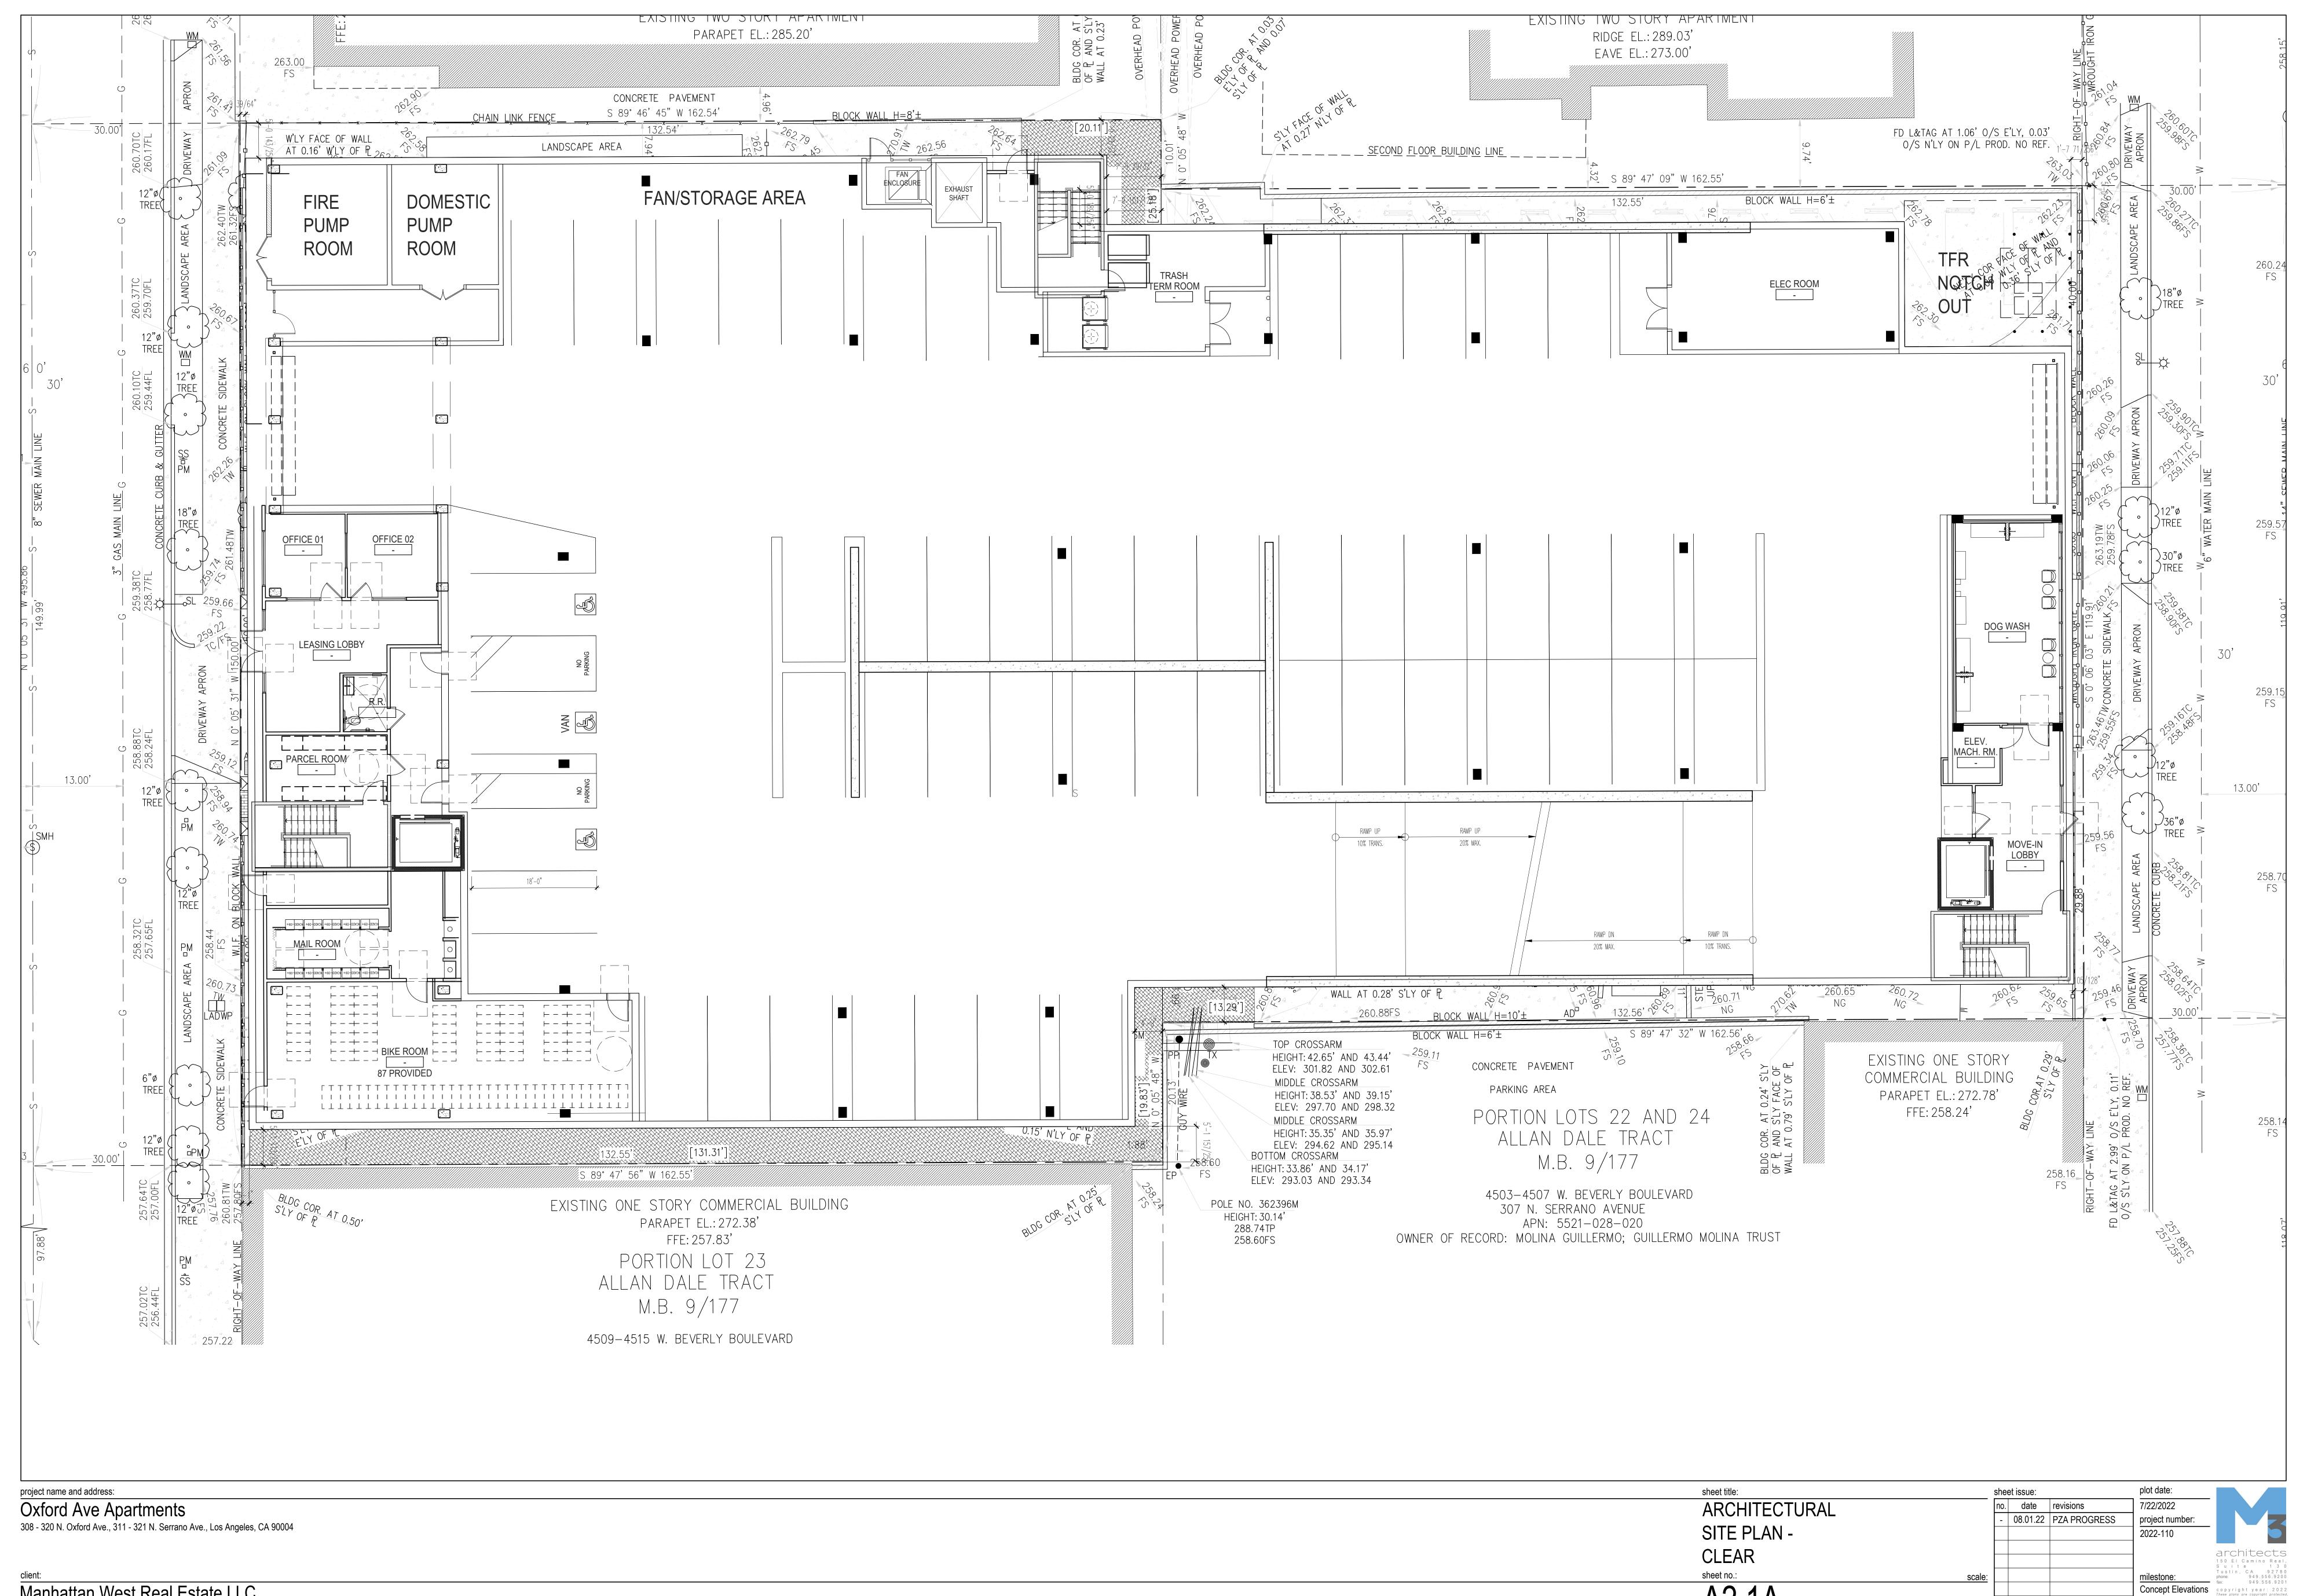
CONCEPTUAL PROJECT SITE PLAN
